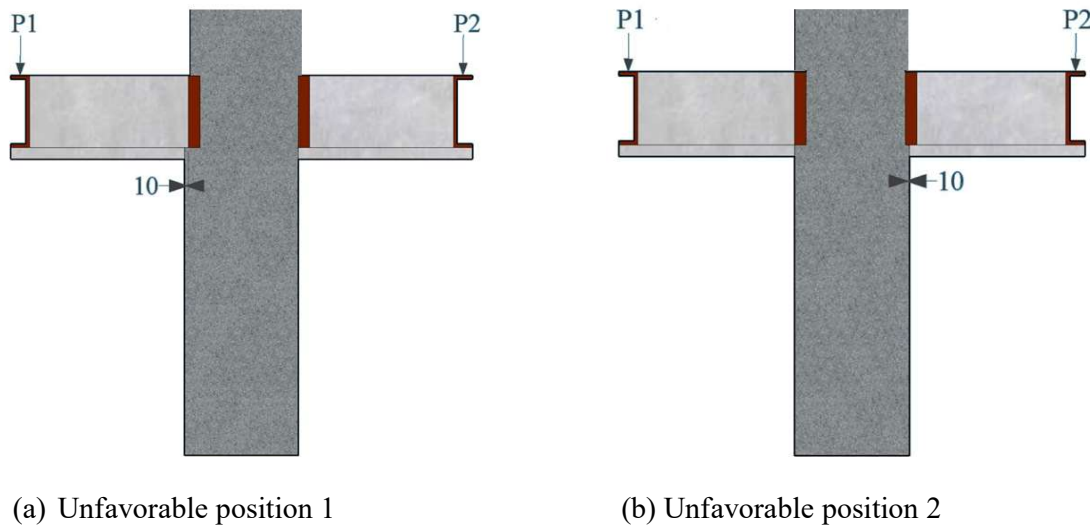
Typical actual (unfavorable) positions of steel profile with reference to RC column
